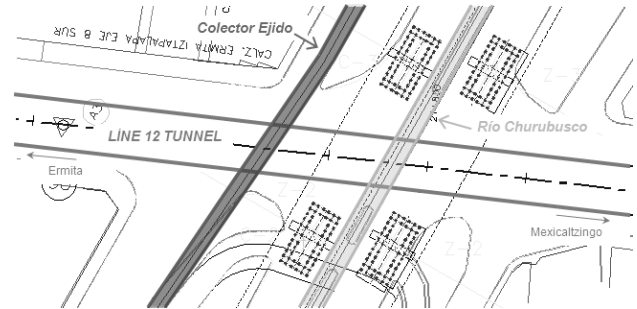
Line 12 tunnel crossing below Rio Churubusco sewer conduction and bridge.
